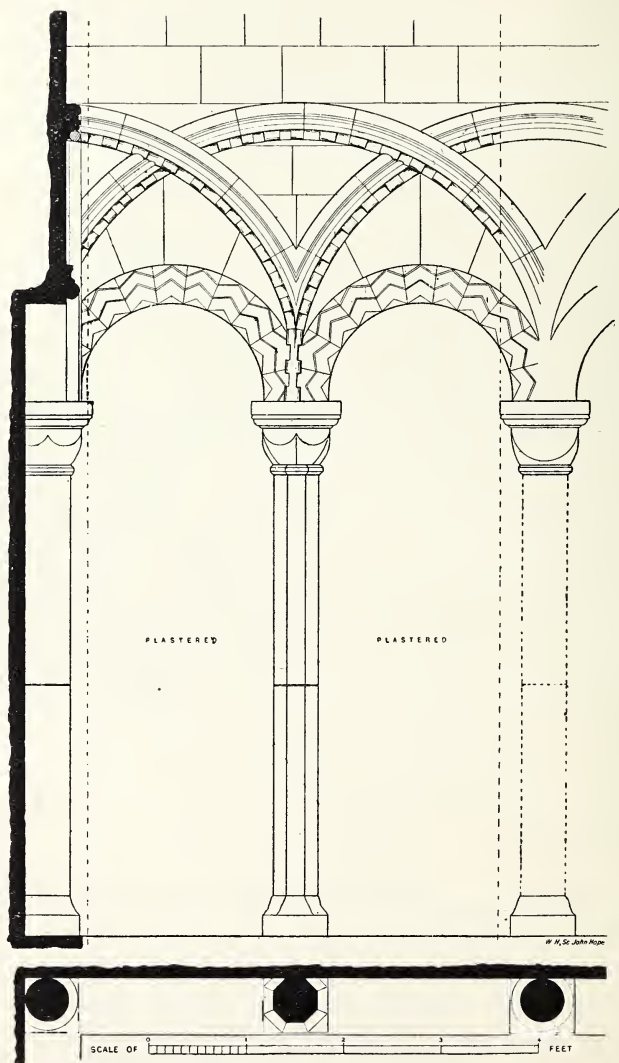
ELEVATION OF THE REMAINING FRAGMENT OF THE CHAPTER-HOUSE WALL ARCADE.
